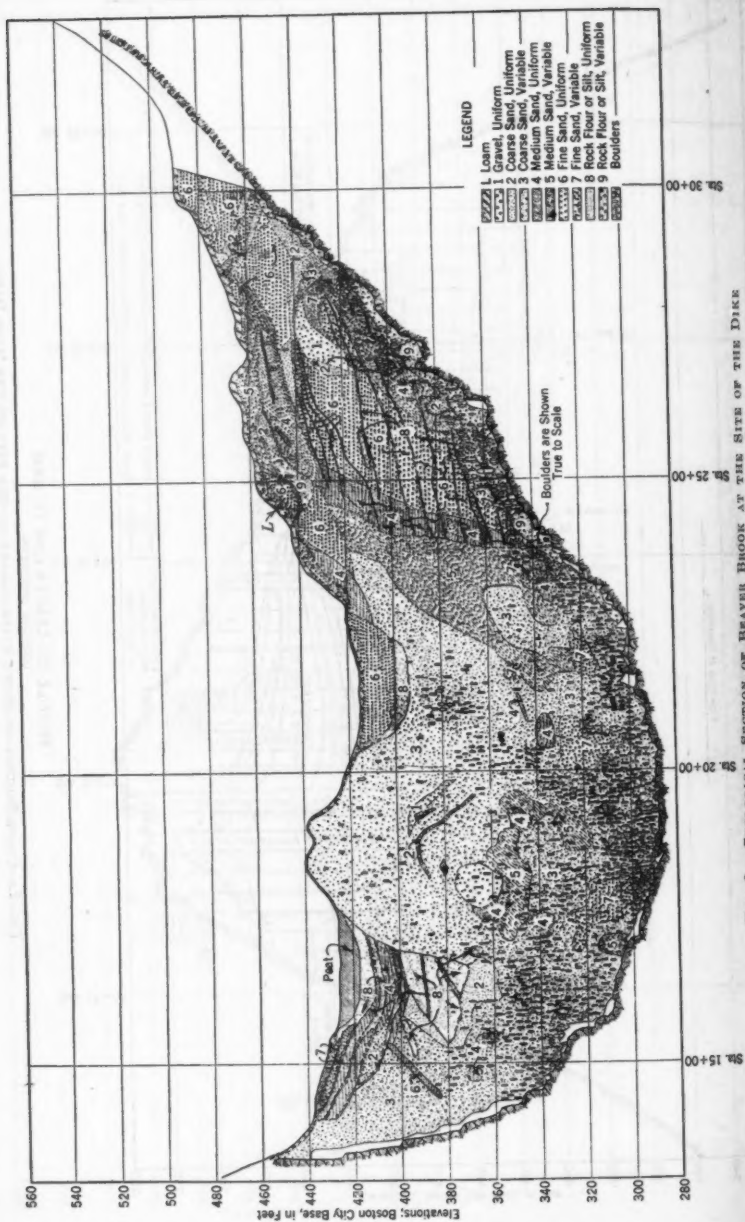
GEOLOGICAL SECTION OF HEAVER BROOK AT THE SITE OF THE DIKE
